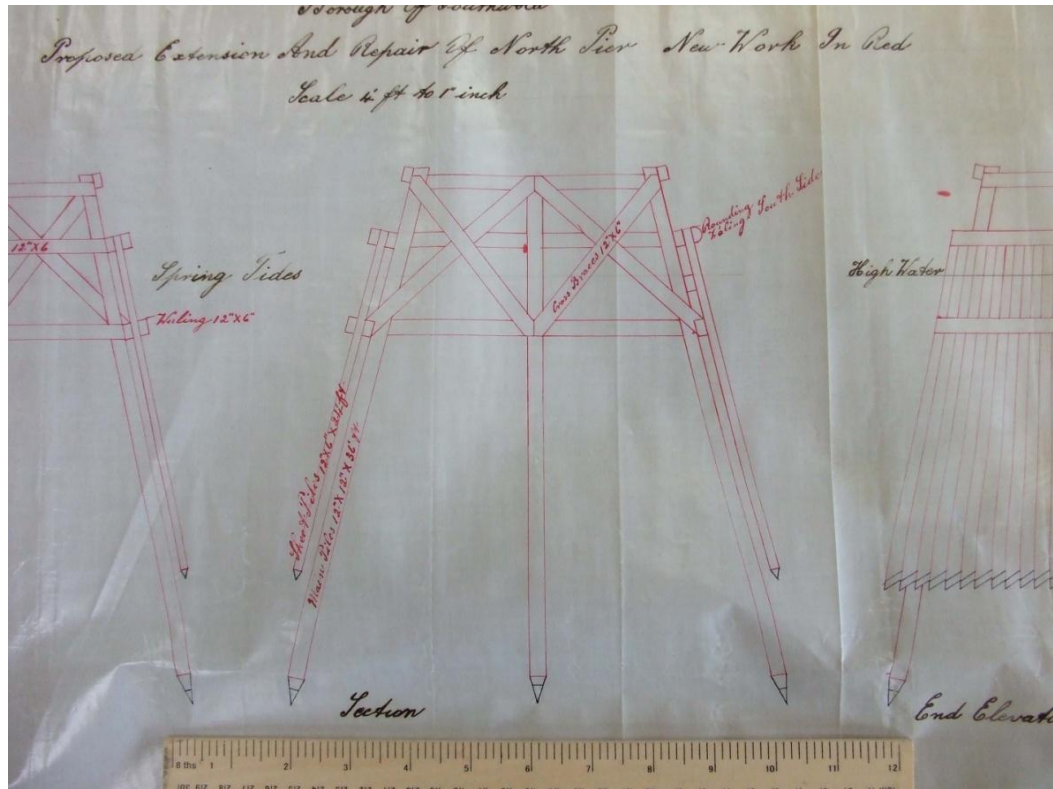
, Southwold, section drawing of 1902 North Pier rebuilding (SRO 1312/6/8)
